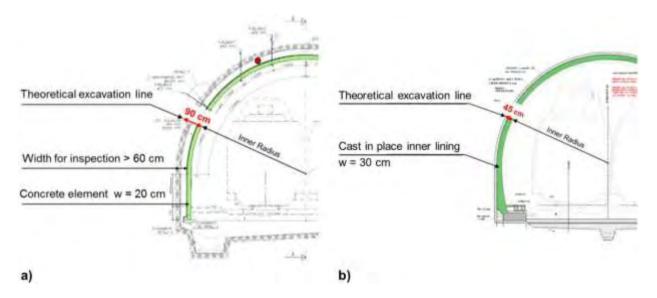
Theoretical excavation line for, (a), inner lining made of precast concrete elements (after [23]) and, (b), inner lining made of cast-in-situ concrete (after [24]).
